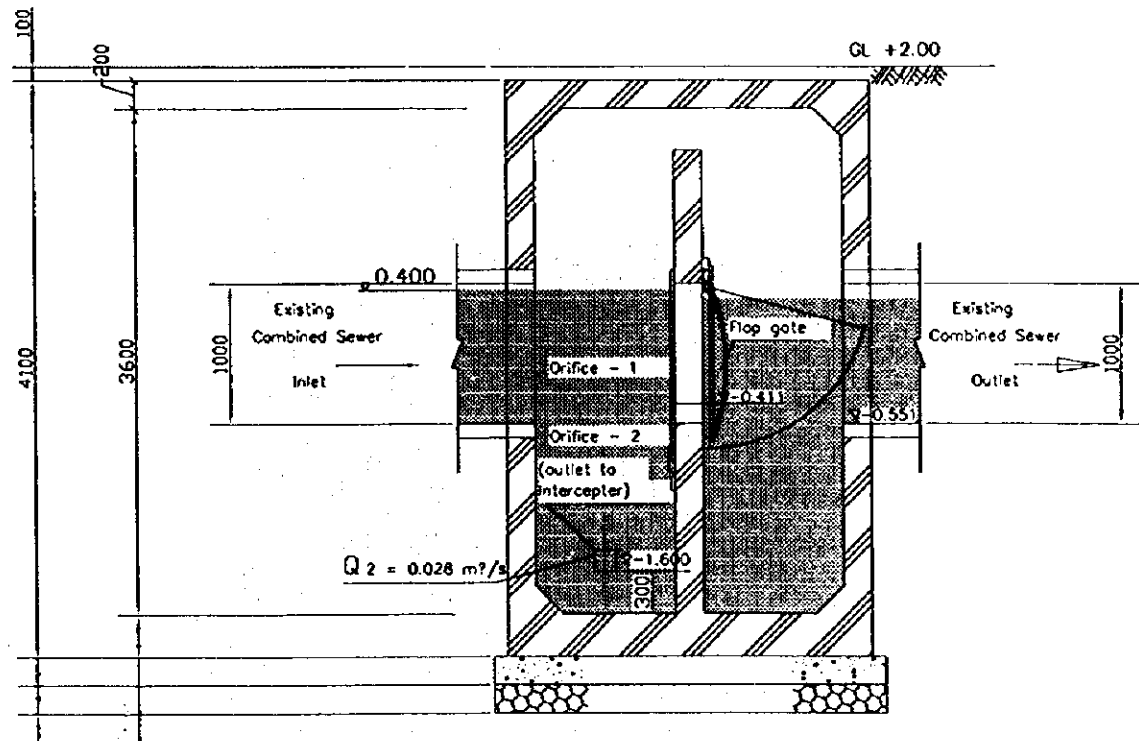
PROPOSED TYPICAL SECTION DIVERSION CHAMBER
